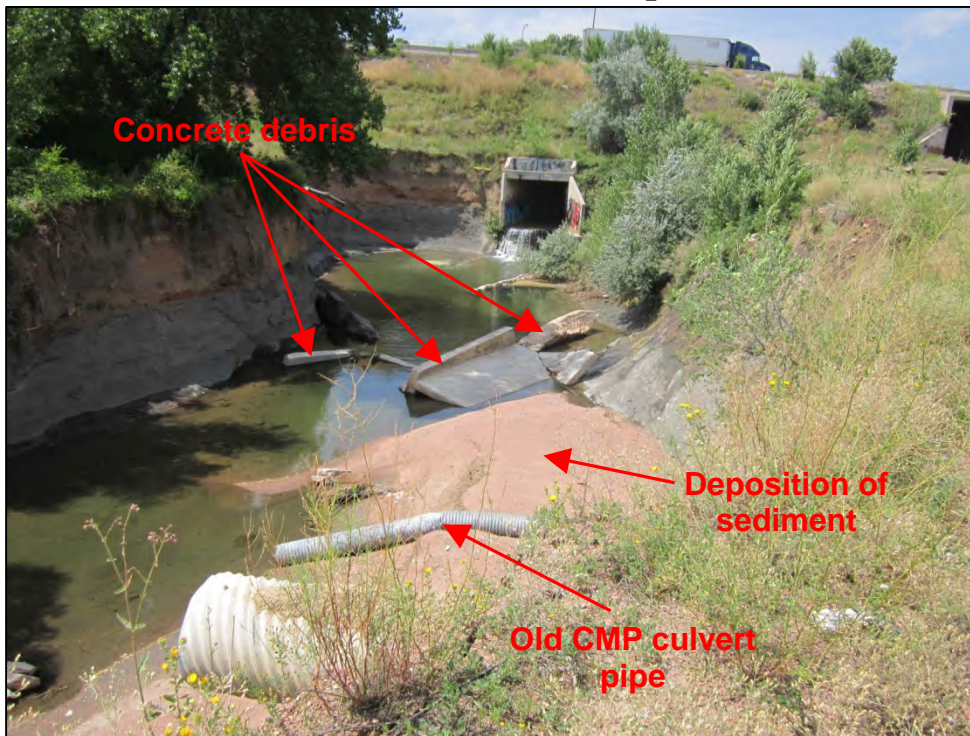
View of significant erosion and scouring of N. Douglas Creek downstream of I-25 box culvert outlet. The vertical embankment was estimated to be approximately 40 feet high. Portions of the concrete box culvert were present in N. Douglas Creek below the area of this photograph. Also, note that the creek bed would have been approximately even with the base of the culvert at the time the culvert was constructed and at the time of the 2015 Inspection it appears to be almost 6 feet lower. In addition, there was significant undercutting beneath the culvert.
